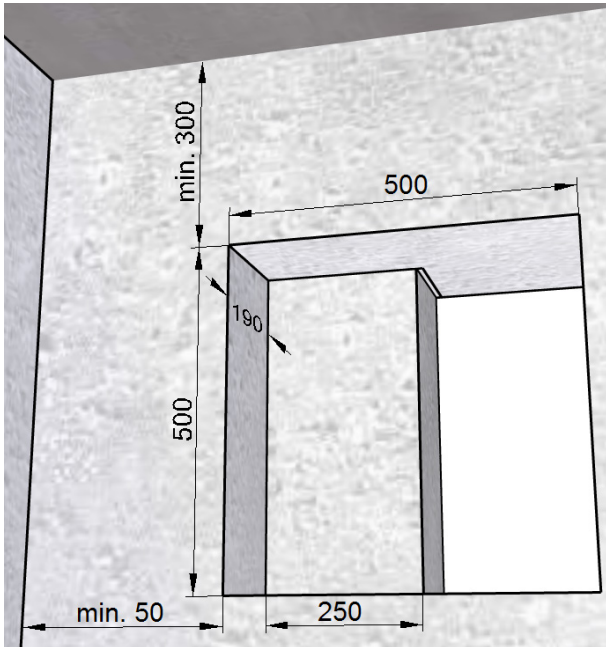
Wall breakthrough for installation kit without filler piece, dimensions in millimetres
